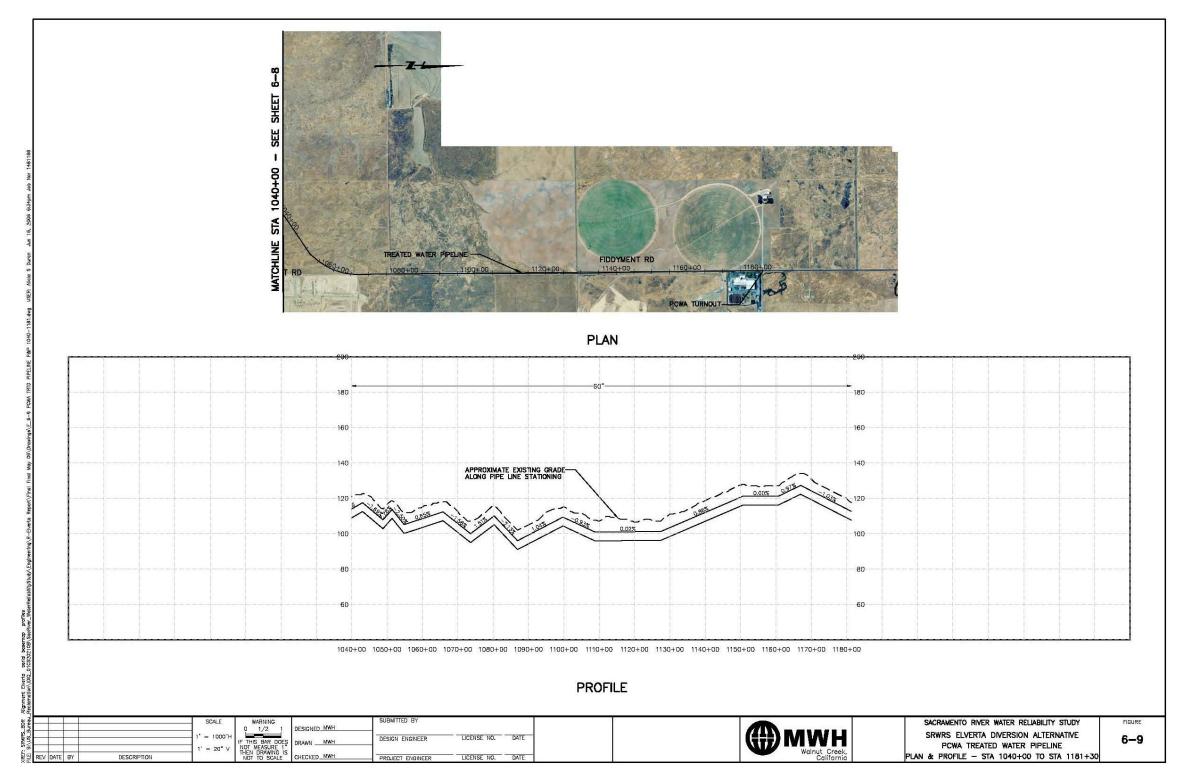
SRWRS Elverta Diversion Alternative PCWA Treated Water Pipeline Plan and Profile – STA 1040+00 to STA 1181+30
